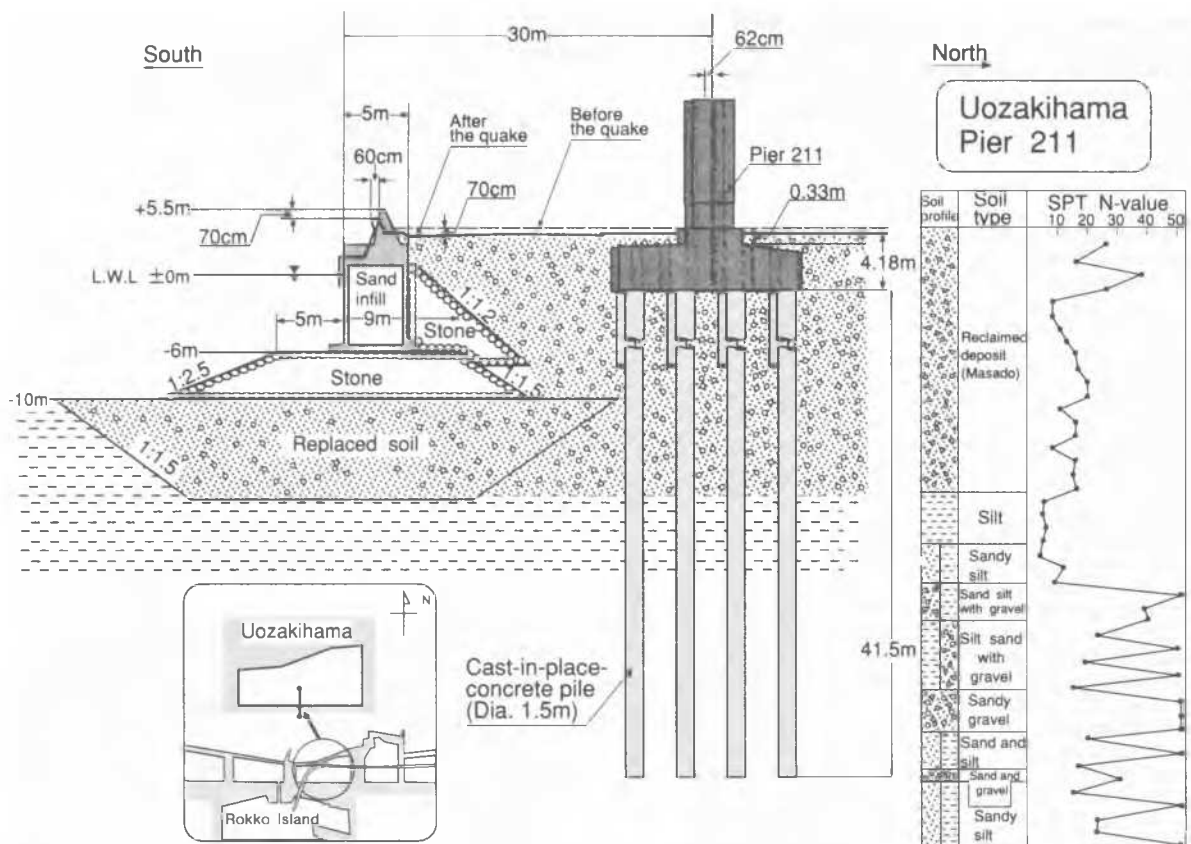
Quaywall, foundation and soil conditions at Pier 211 (Hanshin Highway Authority, 1996)
